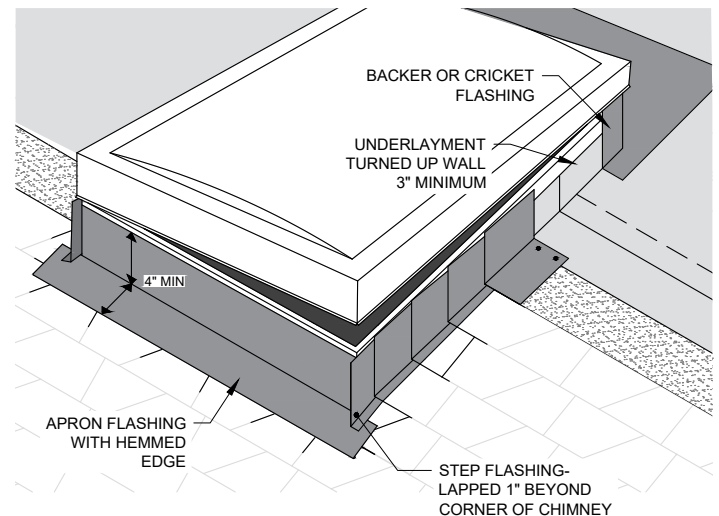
Installation of Self-Adhering Underlayment and Metal Flashings at Roof Openings
